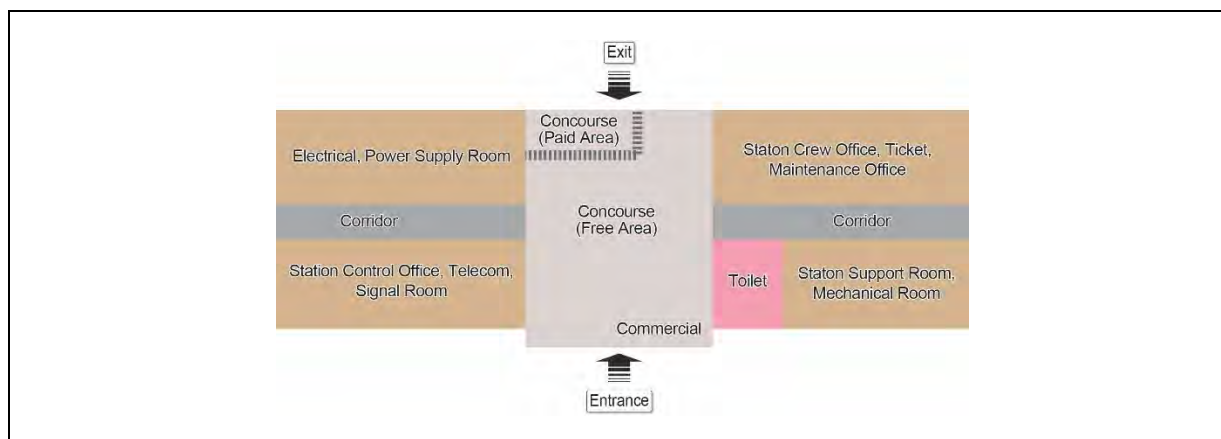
Prototype Station Building Plan of At Grade Type Medium Station
